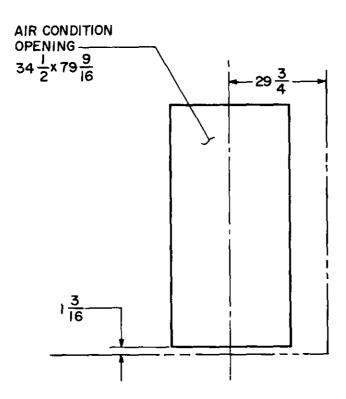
Air conditioner opening (see drawing 1338AS111).
